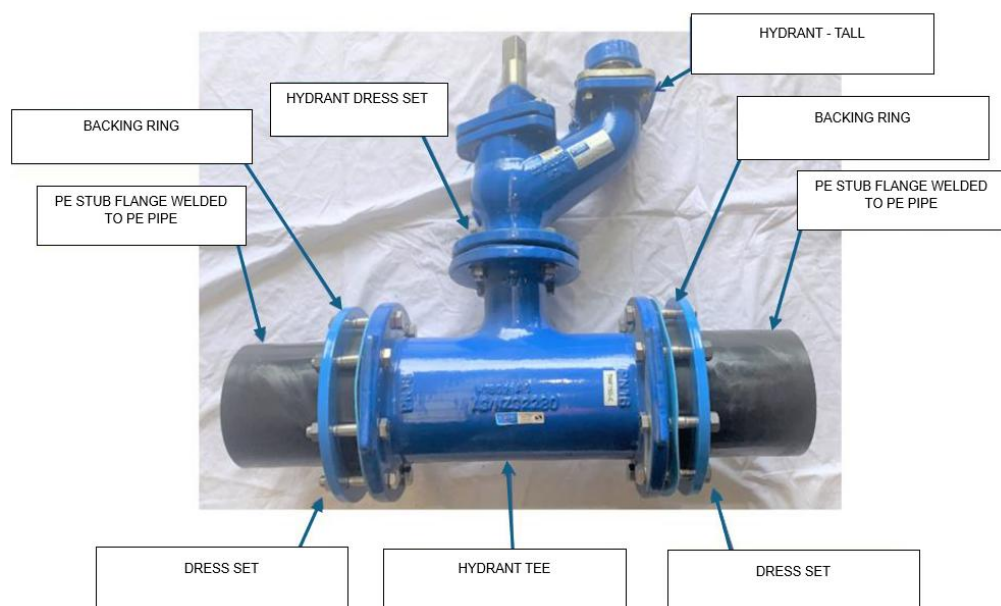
Example of assembled hydrant to a PE pipe (without riser).
